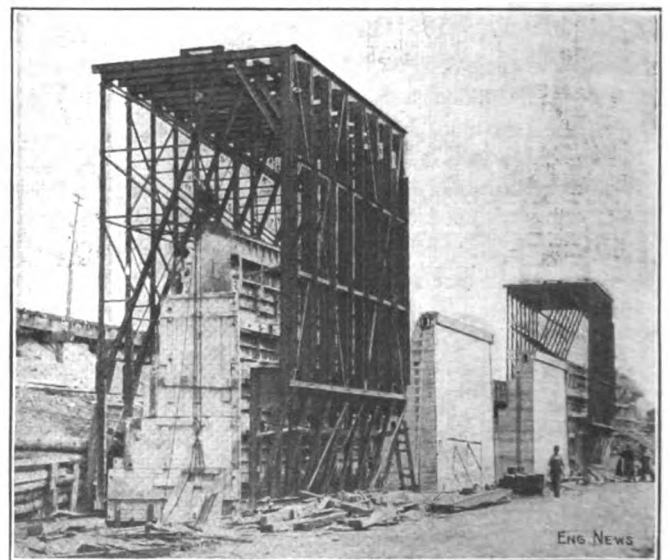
BUILDING CONCRETE RETAINING WALLS IN 35-FT. SECTIONS IN TRAVELING STEEL FORMS; ROCK ISLAND LINES
